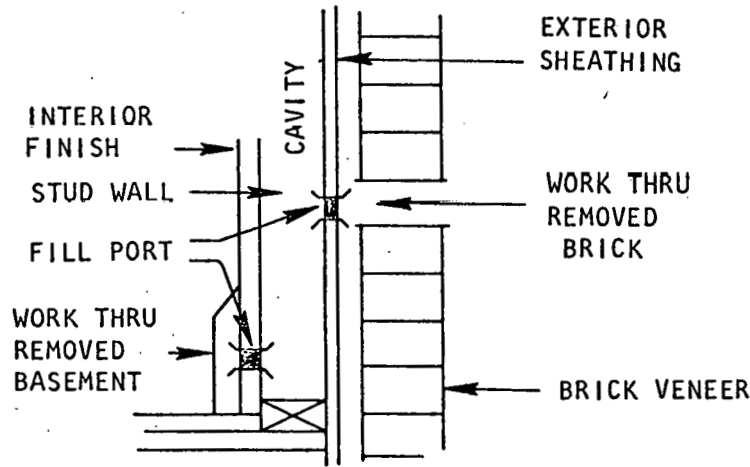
Alternate Points of Entry for Fill Tube in Brick-Veneer Construction
